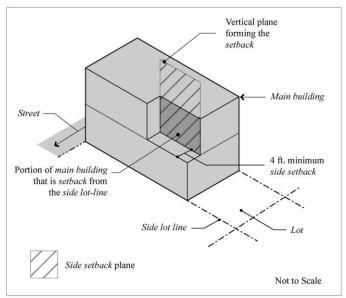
Side Setback Requirement if Setback Provided: Isometric View
